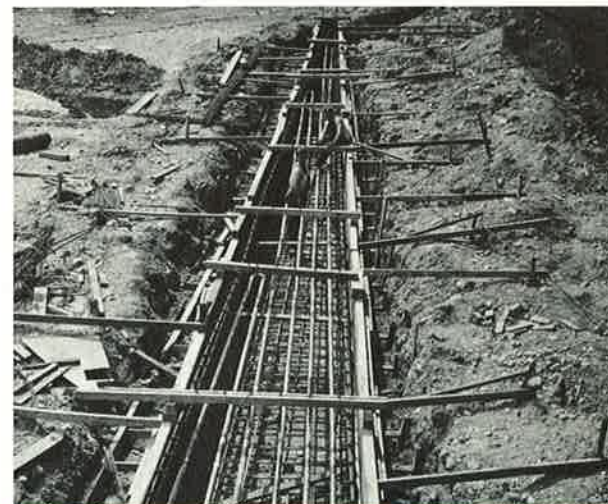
Coils were cast into the reinforced concrete trackway for the American Airlines hangar doors at the Chicago Municipal Airport.
